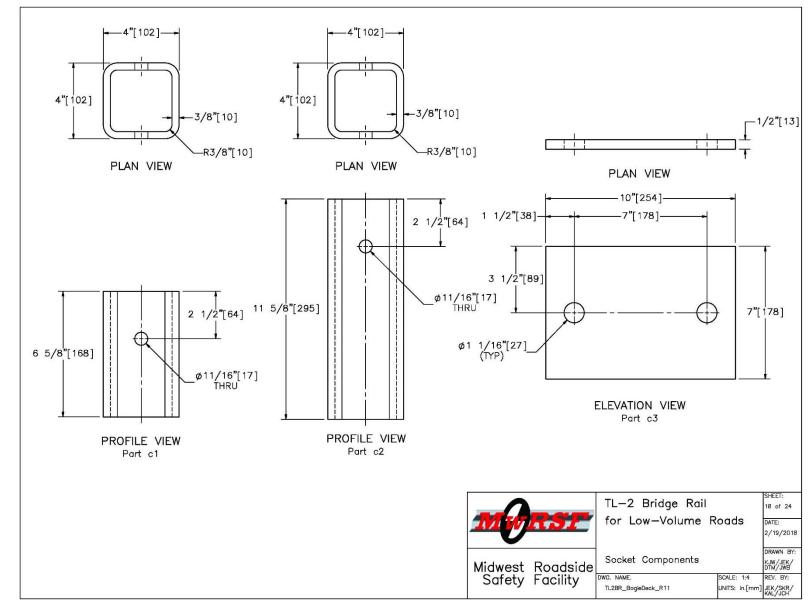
Bogie Testing Matrix and Setup, Socket Components
